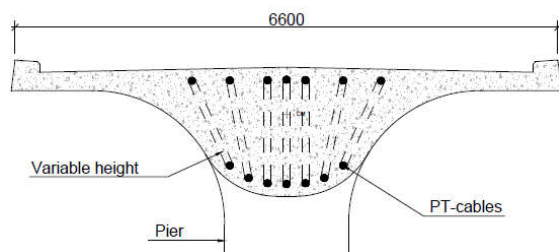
Cross section for the proposed post-tensioned concrete bridge solution.
